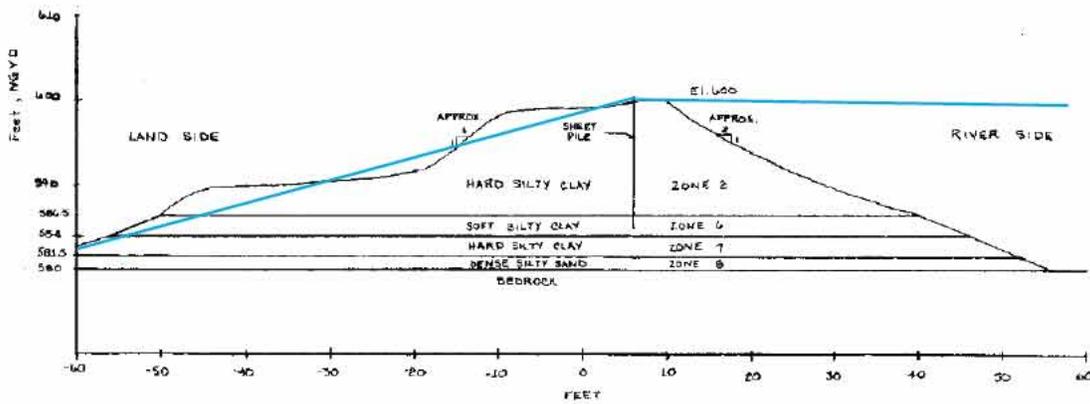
1980's Cross Section with phreatic line drawn "...high straight line from 600 elevation to tailwater in the drainage ditch."
